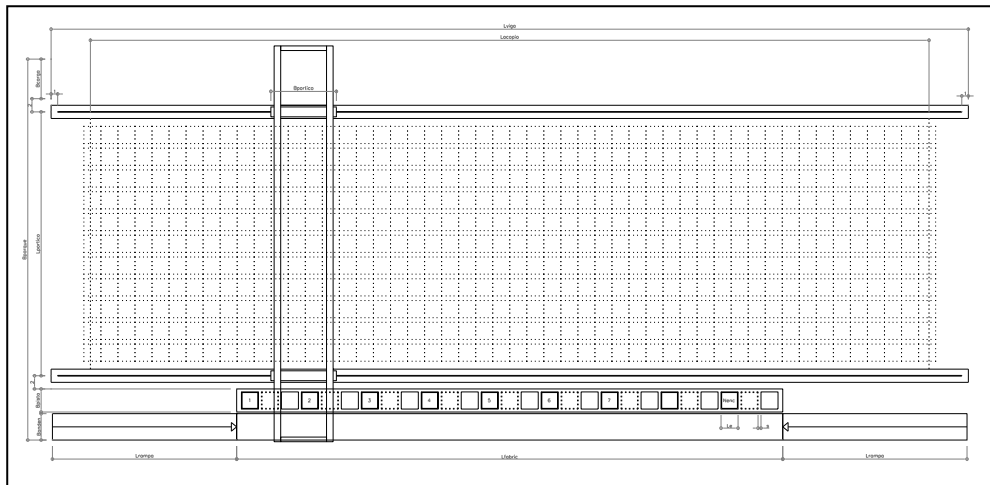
Schematic plan view of an intensive block yard with gantry crane.
